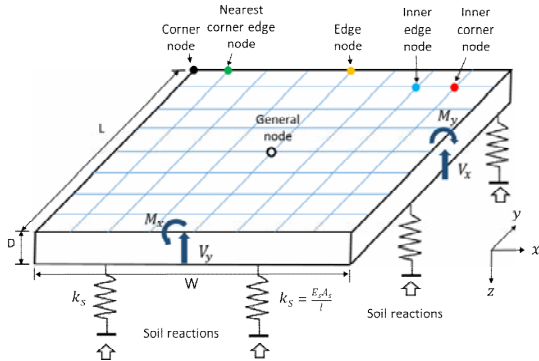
Layout and discrete nodes of a vertically loaded raft foundation
